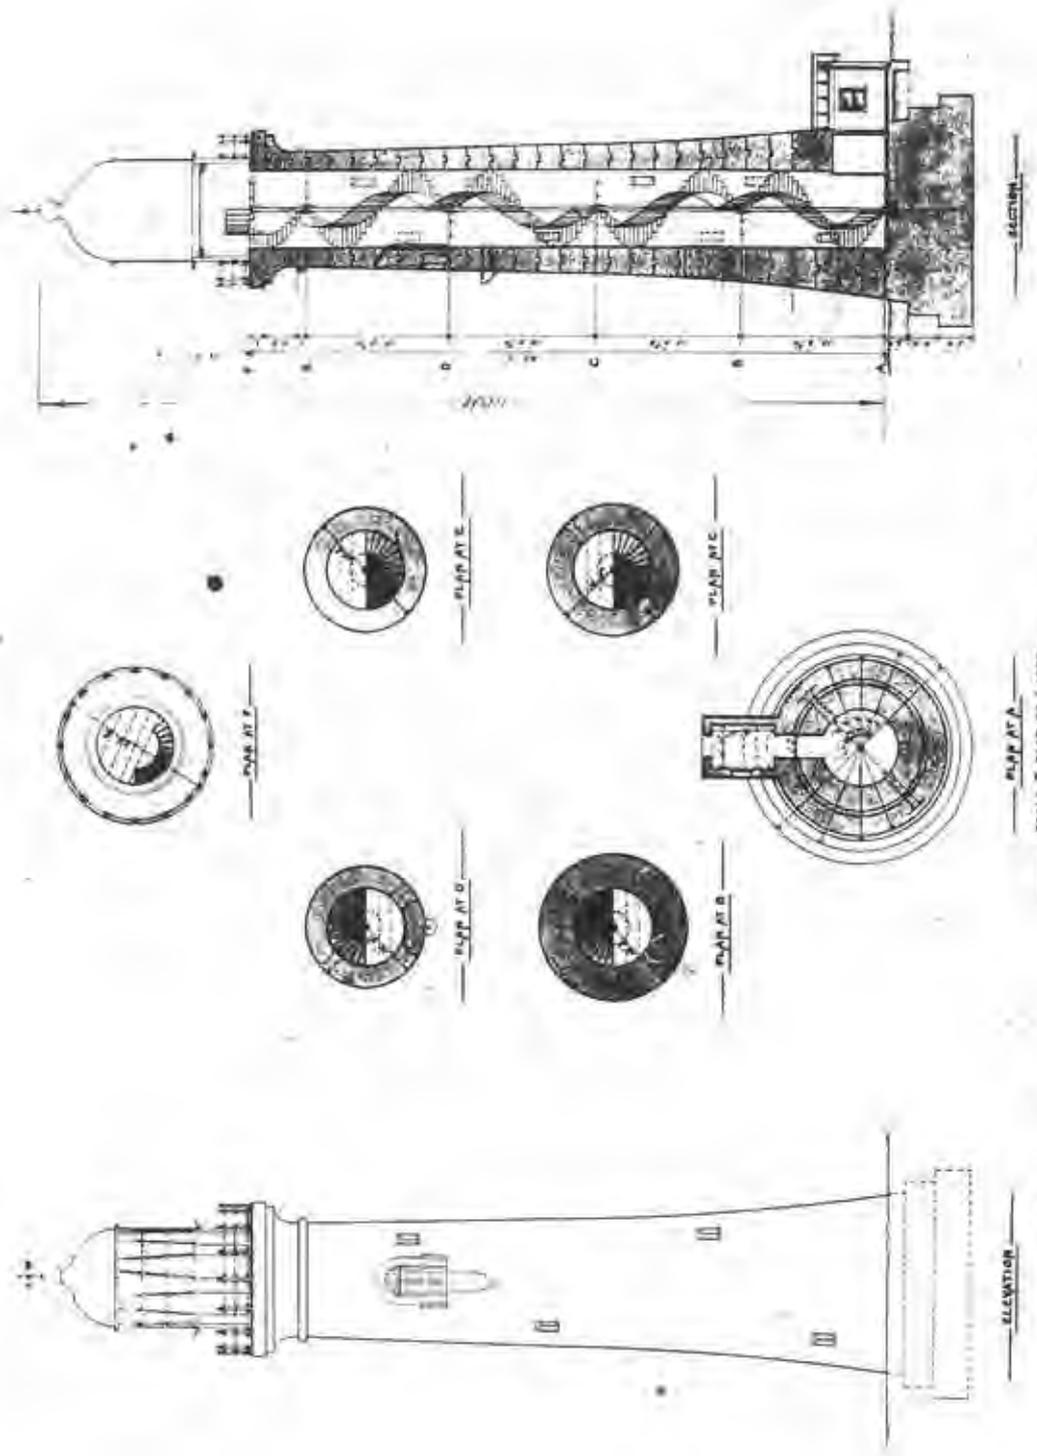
Original construction drawings for the lighthouse, dated 1889.
